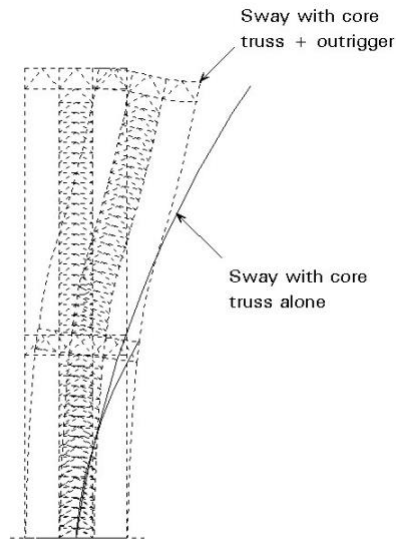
Improvement in overall stiffeners due to outrigger-bolt trusses
